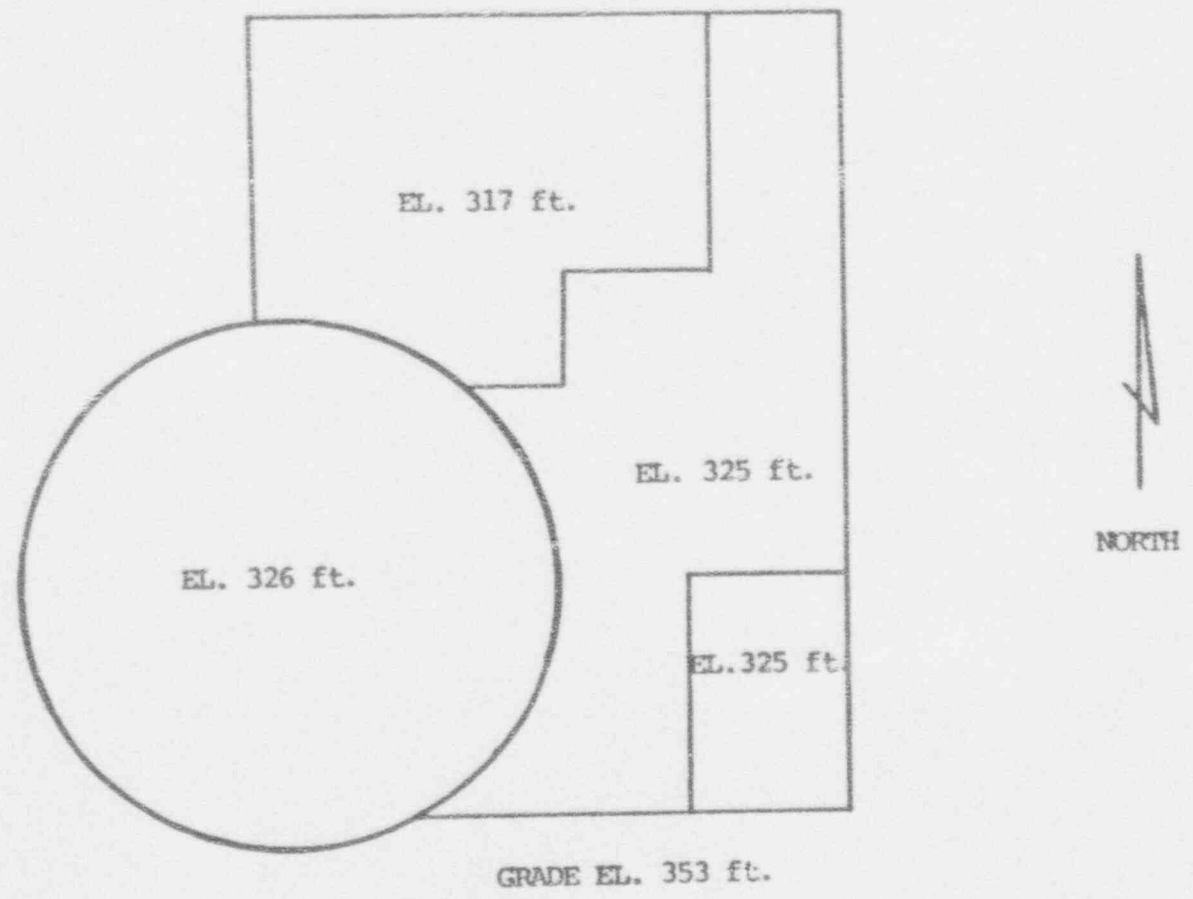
ANO-1 Grade and Foundation Elevations for Reactor and Auxiliary Buildings
